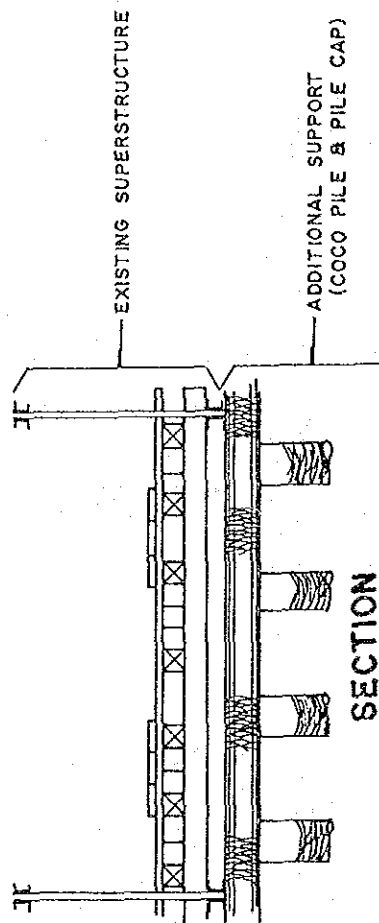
SUPPORT FOR WEAK TIMBER BRIDGE
